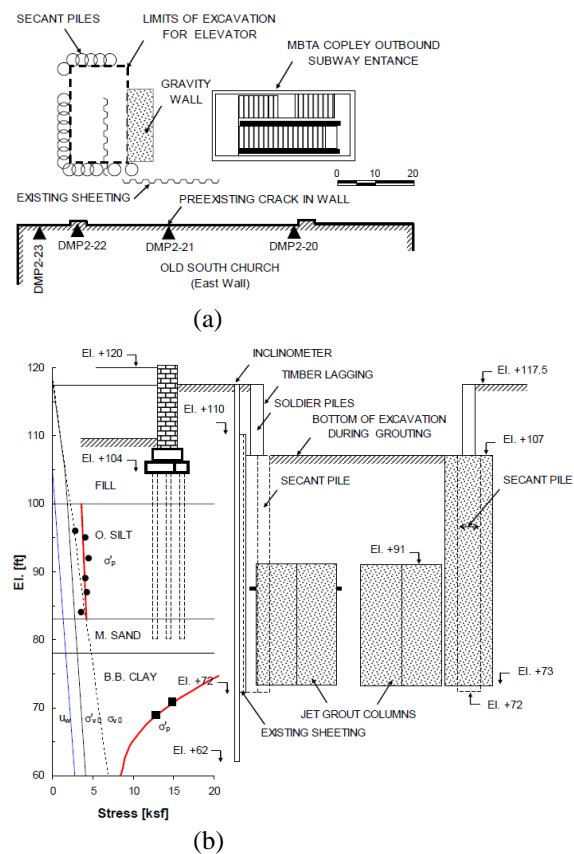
Plan (a) and Elevation (b) of Copley station works (after Pinto et al.).
